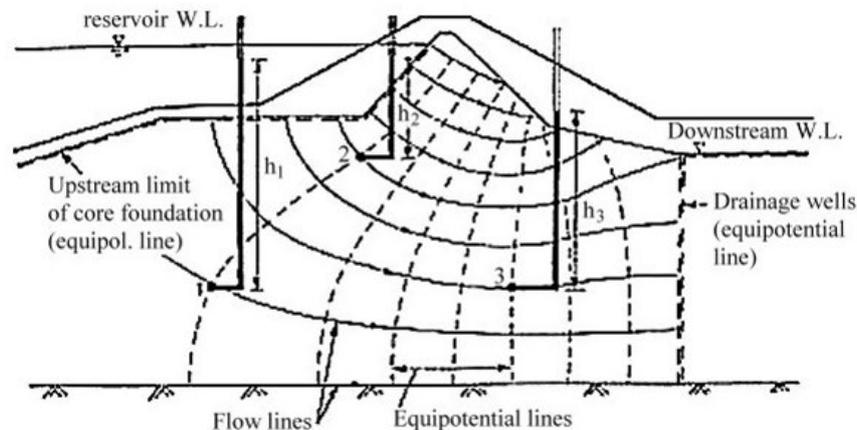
Typical flow net for an embankment dam. Core and foundation are assumed to have the same permeability properties.
